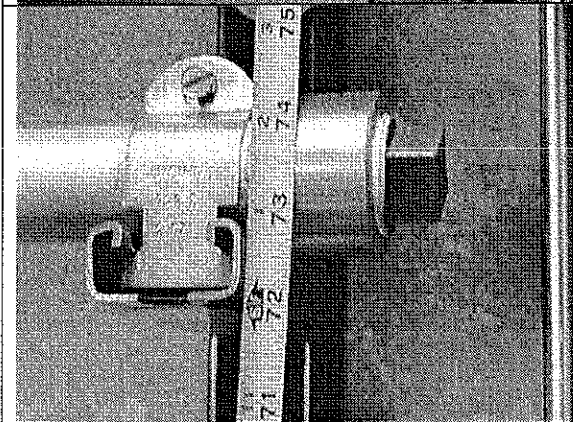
Wall Mount Foot Print (Note: 86" high)
